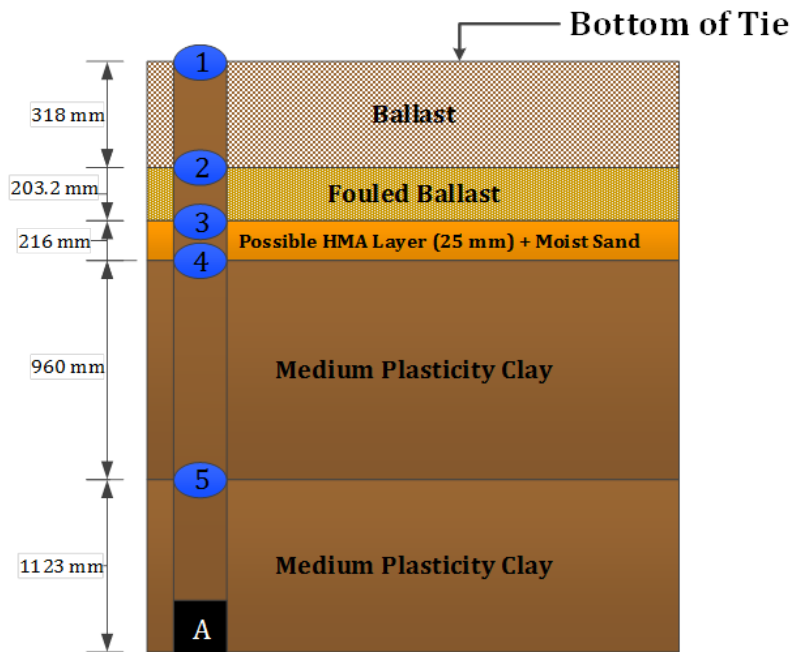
Substructure Layer Profile for Caldwell Street 80 ft From the South Abutment (Track 3; East End of Tie)
